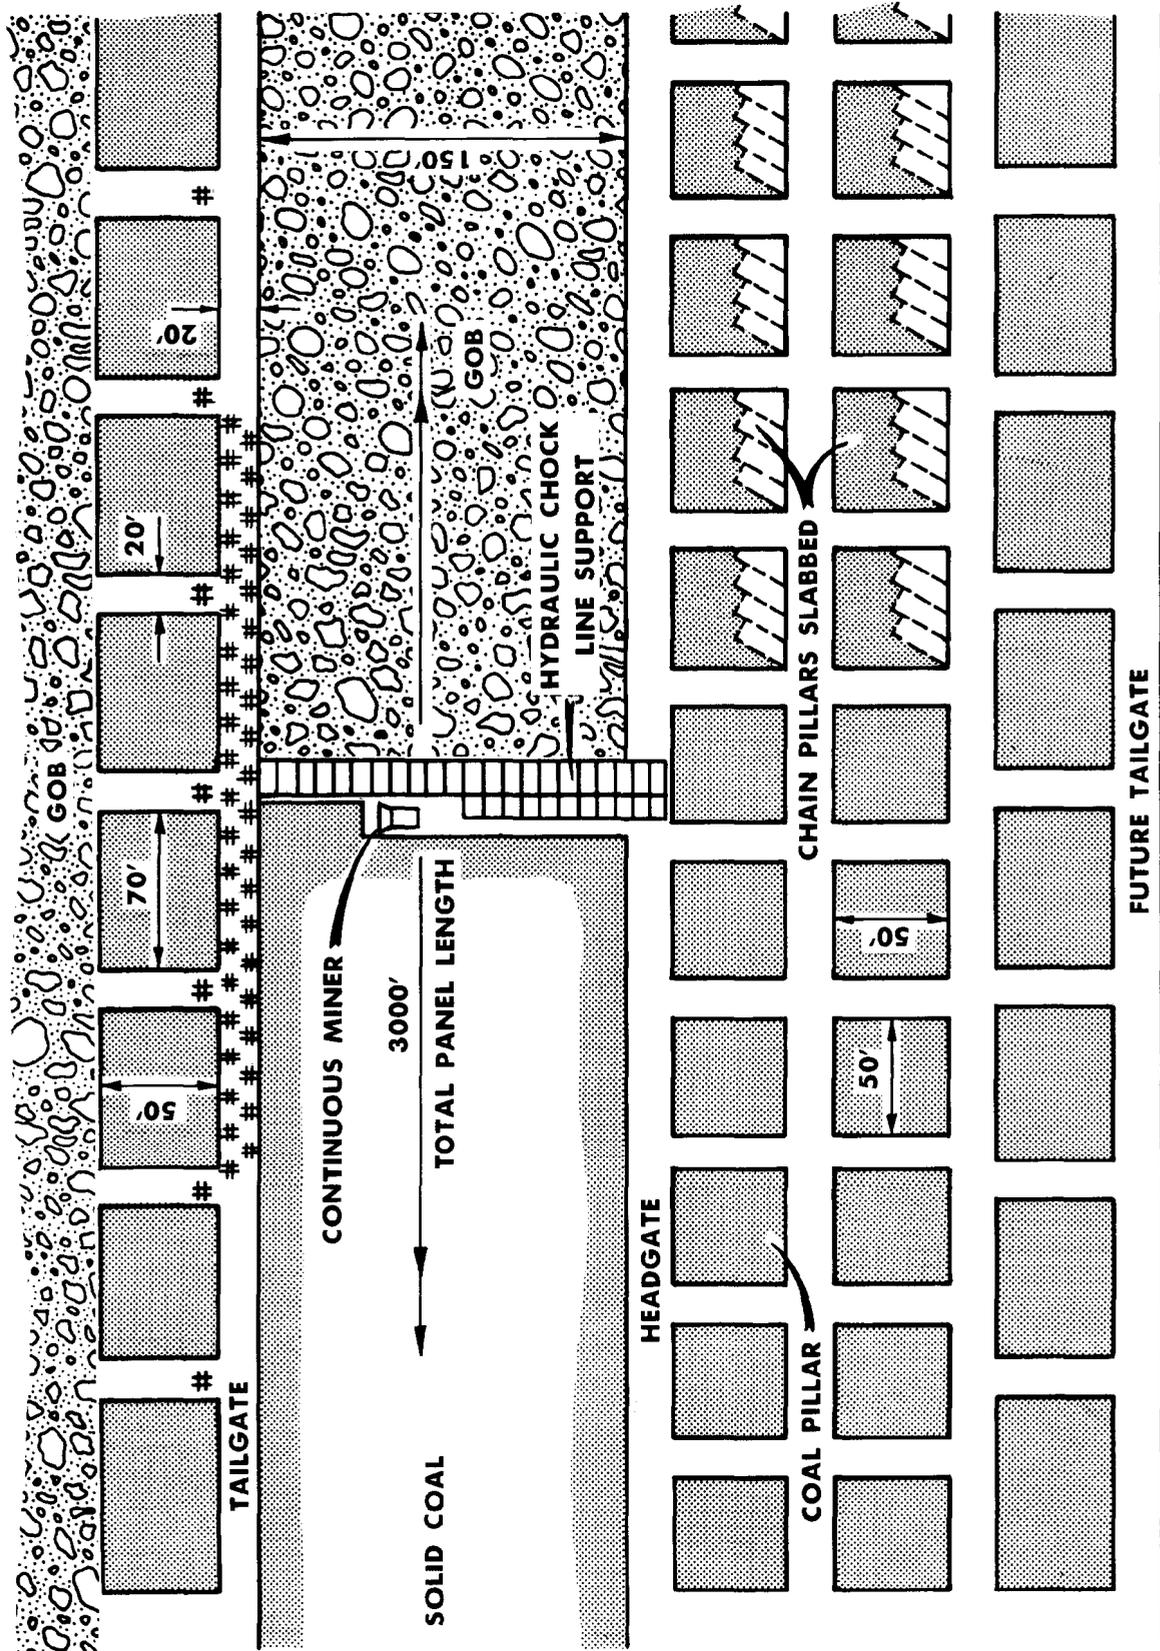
Mine VaA - Plan layout of shortwall section.
